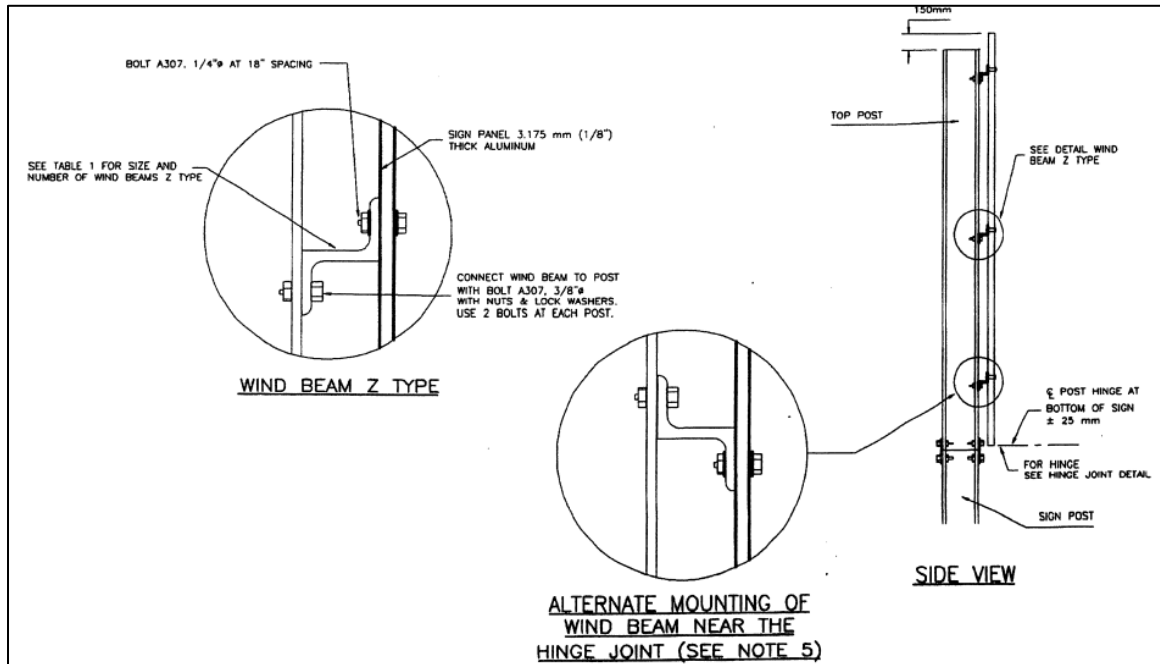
Sign to post connections using wind beams (PRDOT, 2000)
